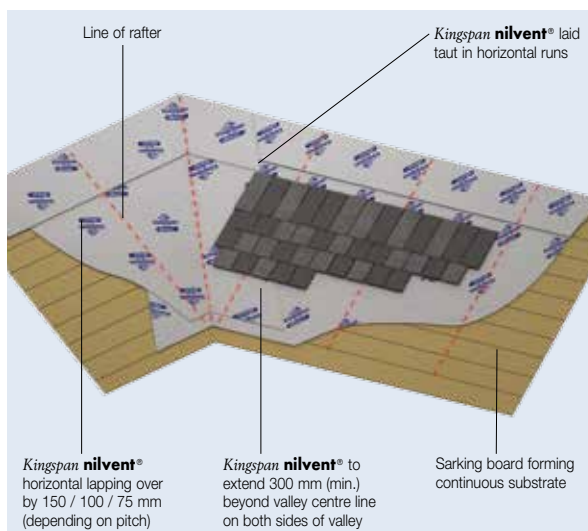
Valleys – Fully Supported Horizontal Installation with Natural Slates
